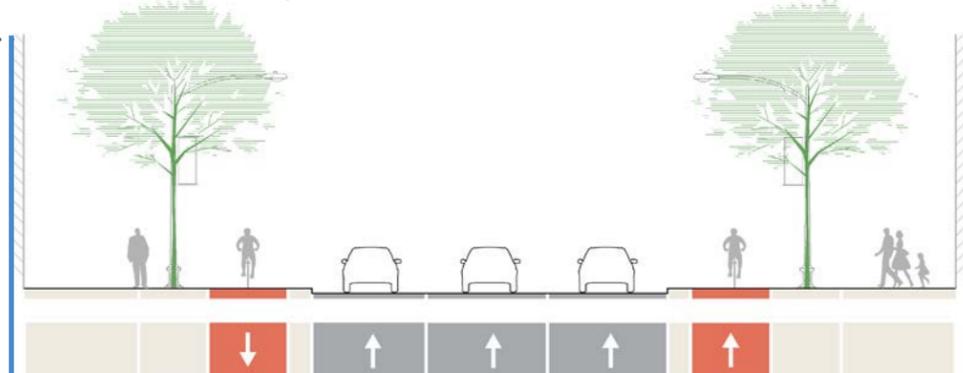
Sixth Street typical section Brazos Street to Guadalupe Street
